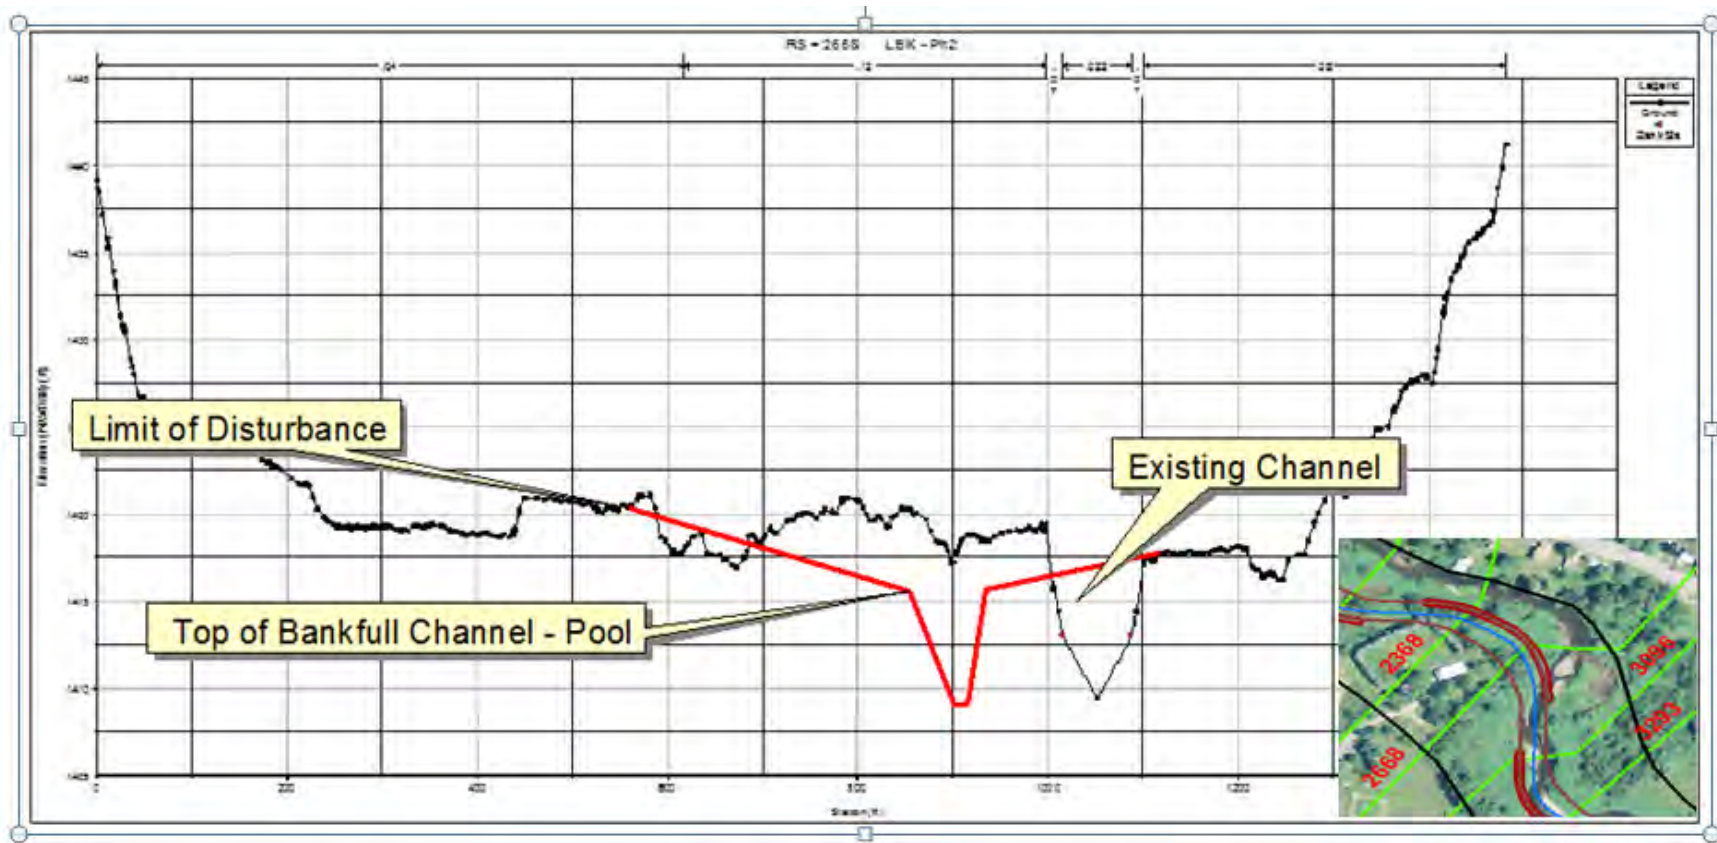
Over Plot of Existing and Post Interim With Plan for X-2668
